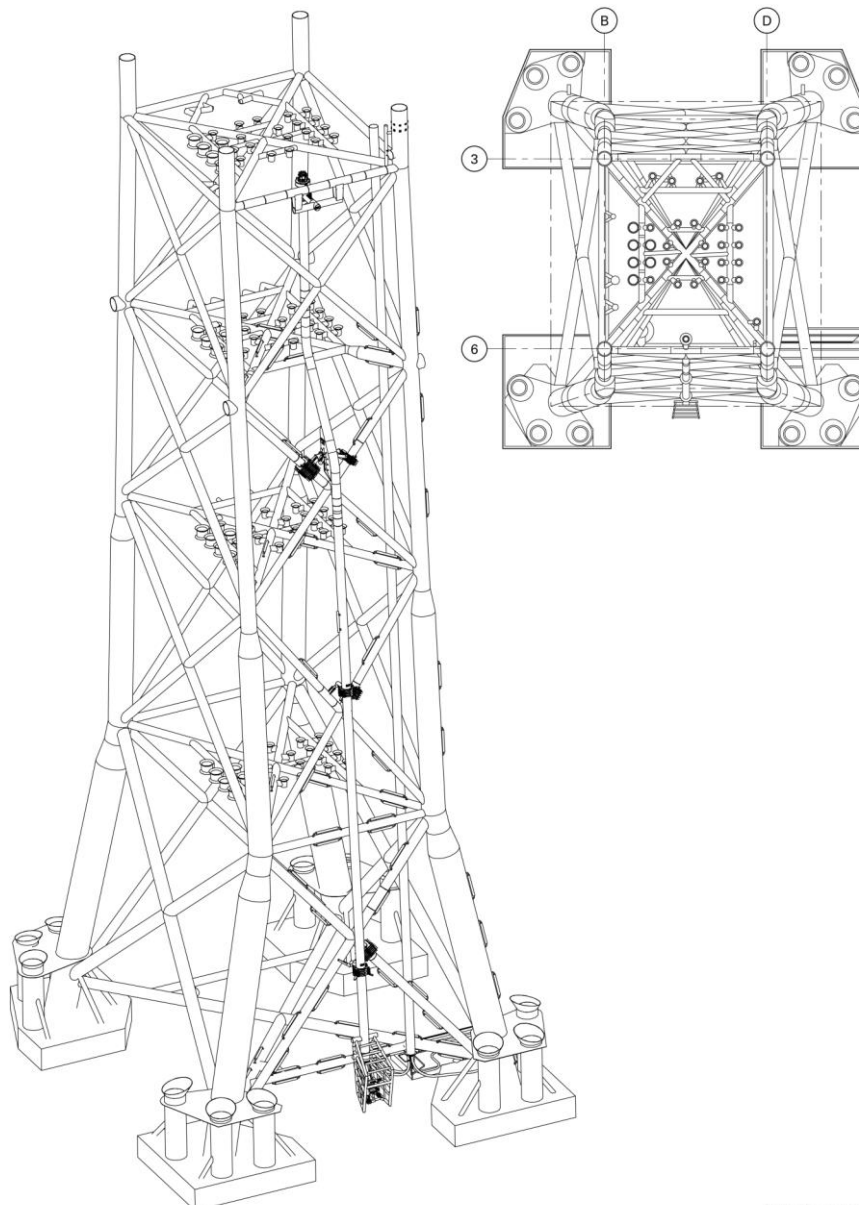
Jacket Isometric and Plan View Drawings
